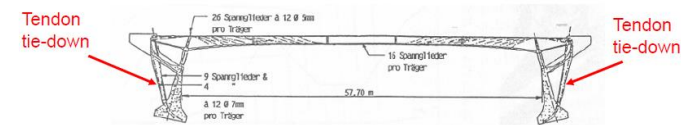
Bridge over river Malle in Belgium, where the failure of the tendon tie-down caused the bridge collapse in 1992. Source: *Durable Post-Tensioned Concrete Structures*. Concrete Bridge Development Group July 2011
